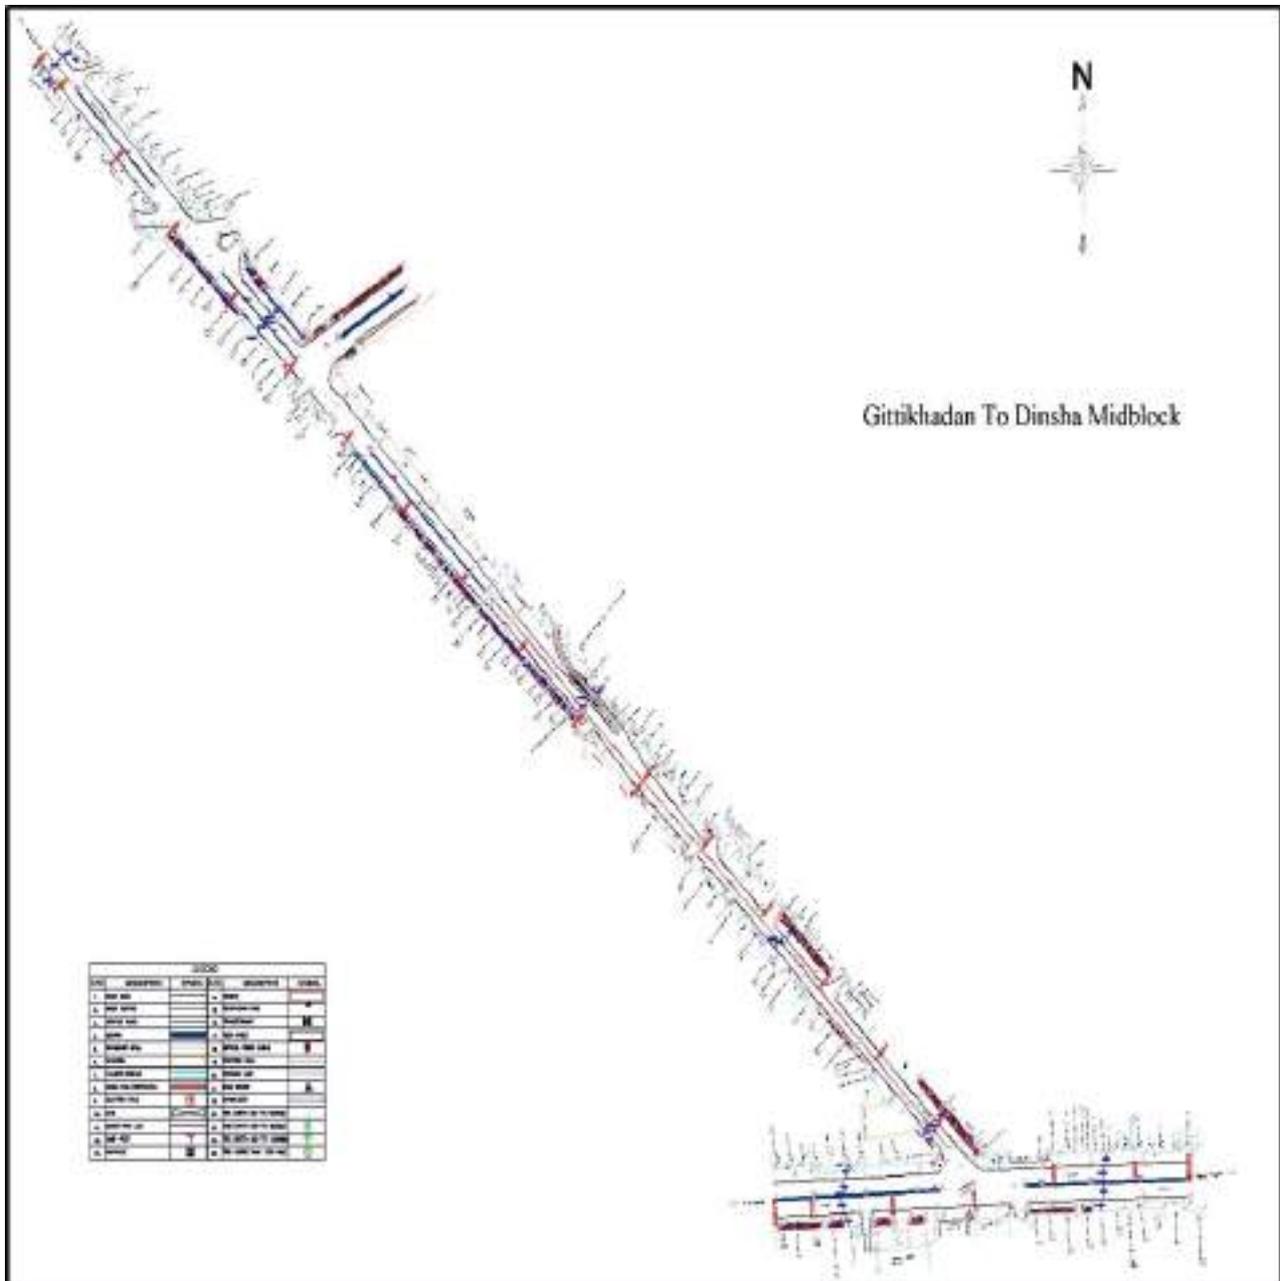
Physical Survey Plan of the Gittikhadan to Dinshaw Factory Road Stretch
